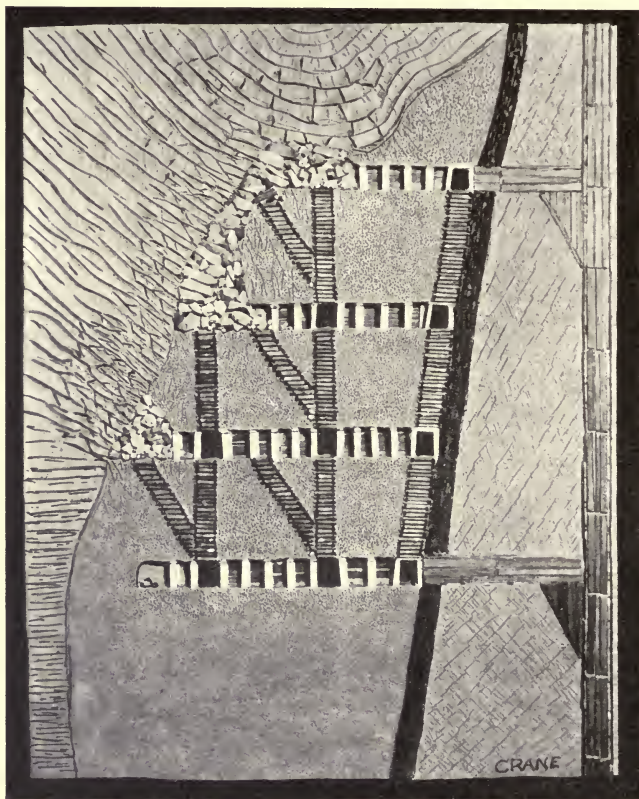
Plan of Block of Bad Ground worked by Sub-drift Method.
